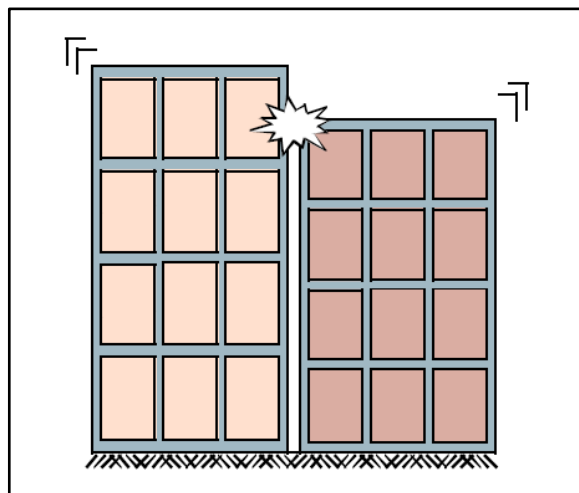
Different floor height of adjacent buildings and potential point of damage (from Guragain et al., 2004) .
